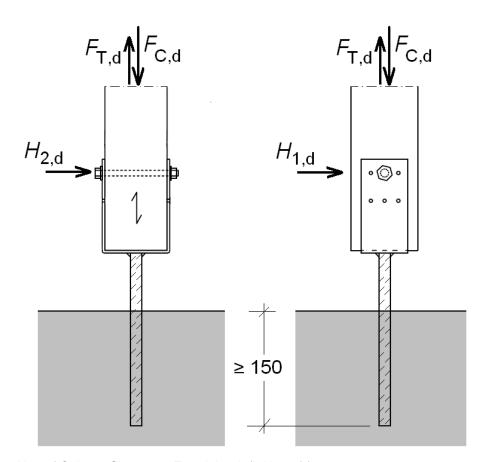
Use of Column Shoe type E and the definition of forces.
